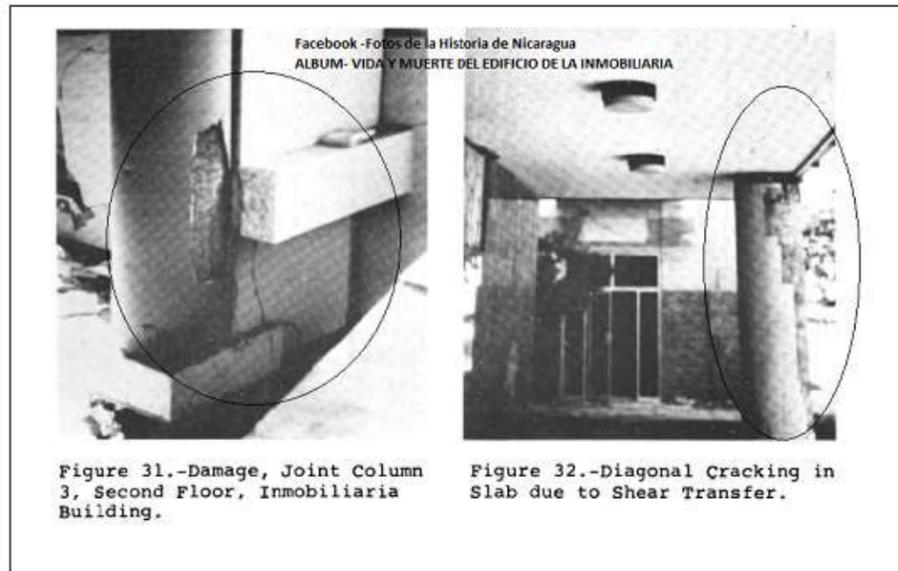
Damage, Joint Column 3, Second Floor, Inmobiliaria Building.
